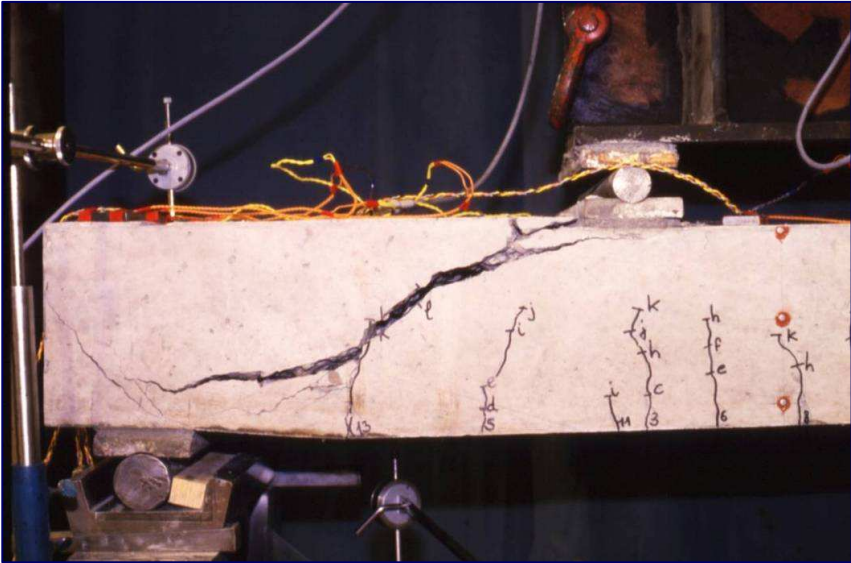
Shear failure of a concrete beam, without stirrups with rectangular cross-section
